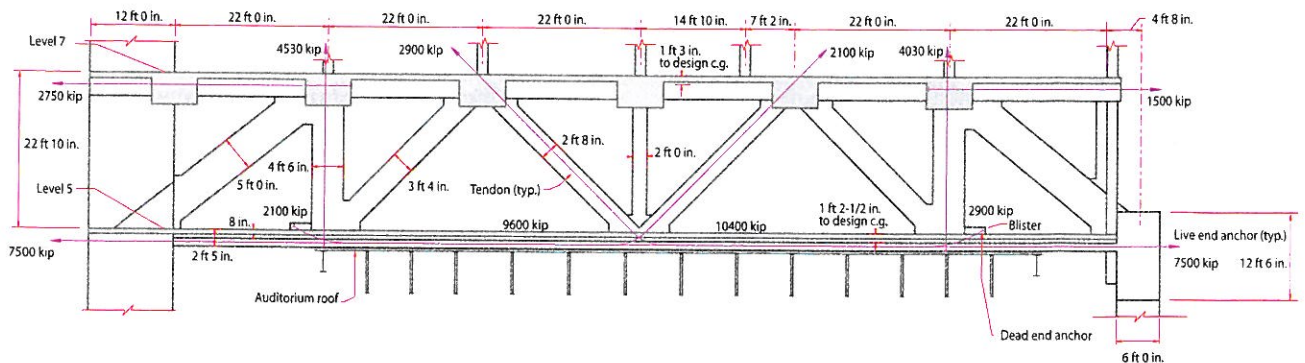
Elevation of truss line 2 (1 ft = 0.305 m; 1 in. = 25.4 mm; 1 kip = 4.45 kN)
